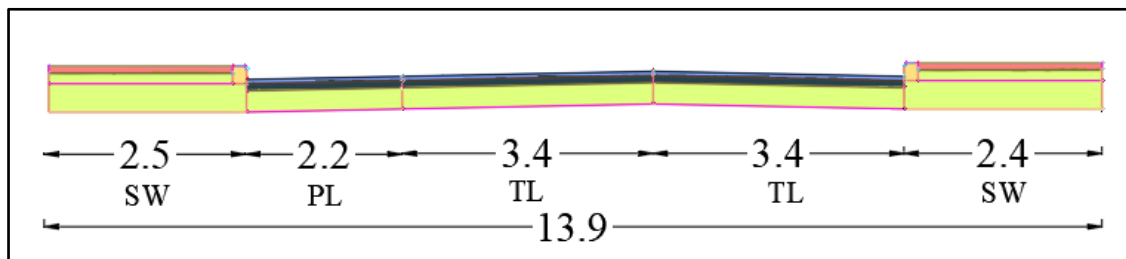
Omar Ibn Al-Khattab Street , Section No. 2 (Existing Cross Section).
